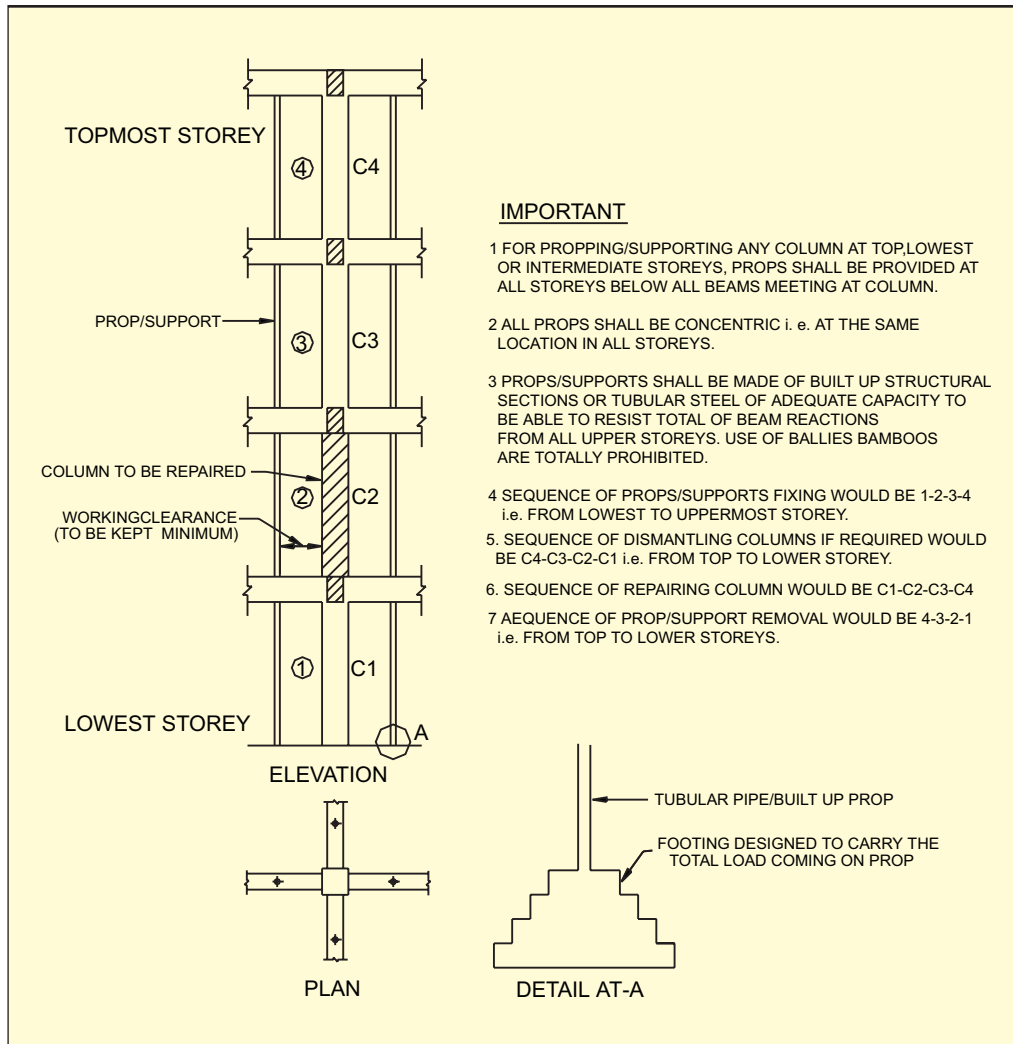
Typical Arrangement For Propping & Supporting a Column to Relieve at Form Load
